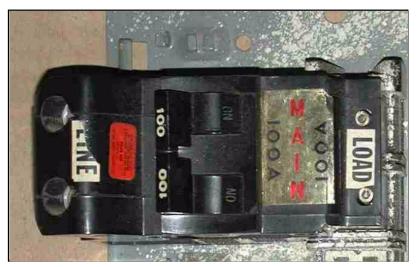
FPE 100-AMP MAIN BREAKER CONNECTS TO THE BUSBARS THROUGH THE PLATE & POST CONFIGURATION, USING ONE SOCKET-HEAD 8-32 SCREW FOR EACH POLE TO ATTACH TO ITS CONTACT PLATE.
